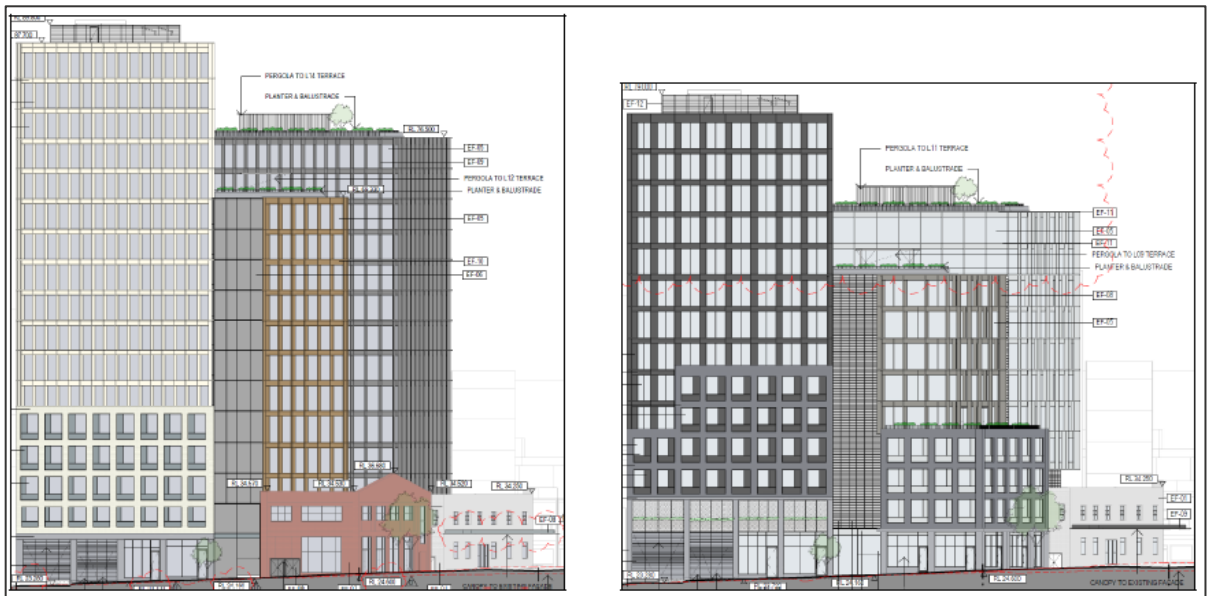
Berkeley Street (east) Elevation - Application Plans (left) Discussion Plans (right)
